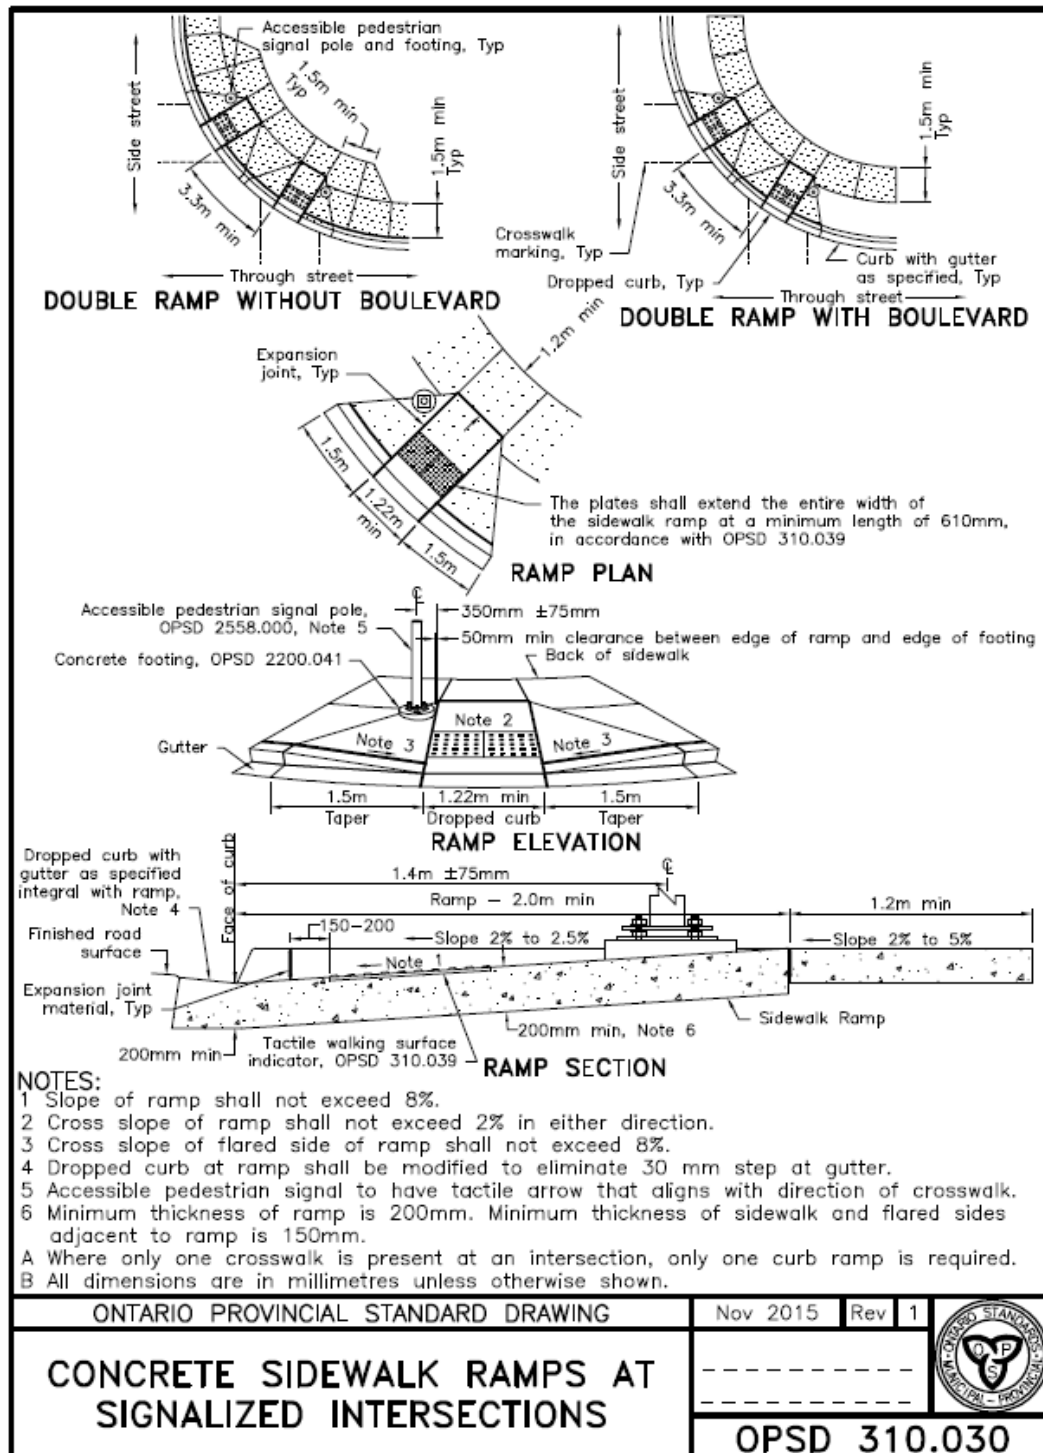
Concrete Sidewalk Ramps at Signalized Intersections
